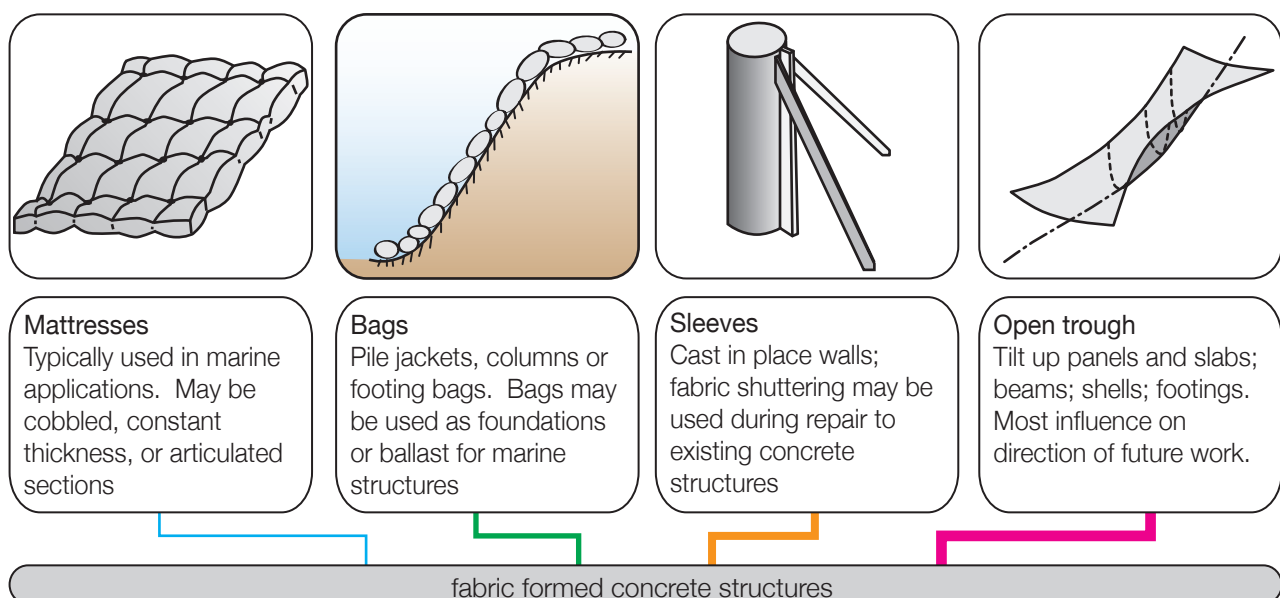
Fabric formwork groupings (after West et al., 2007).
